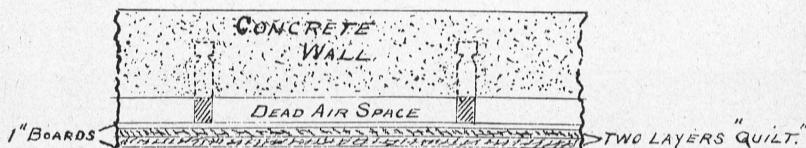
Detail construction of wall of Triangle Orchard Company's apple storage house.
